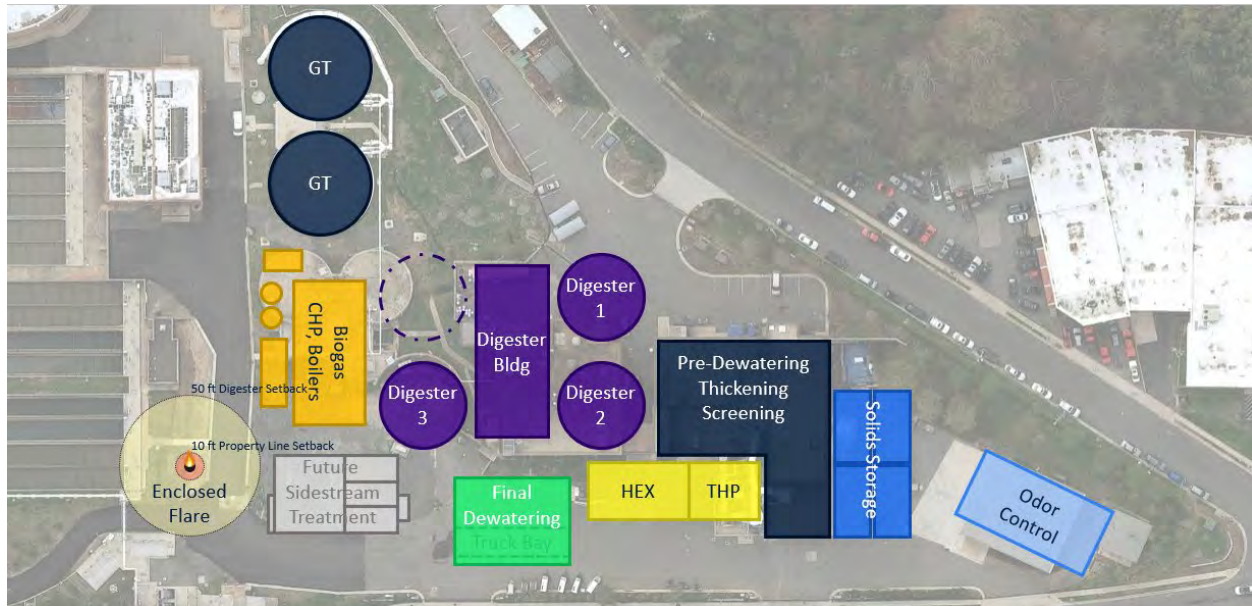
Preliminary Site Layout, Alternative 1: Renovate Existing DWB
